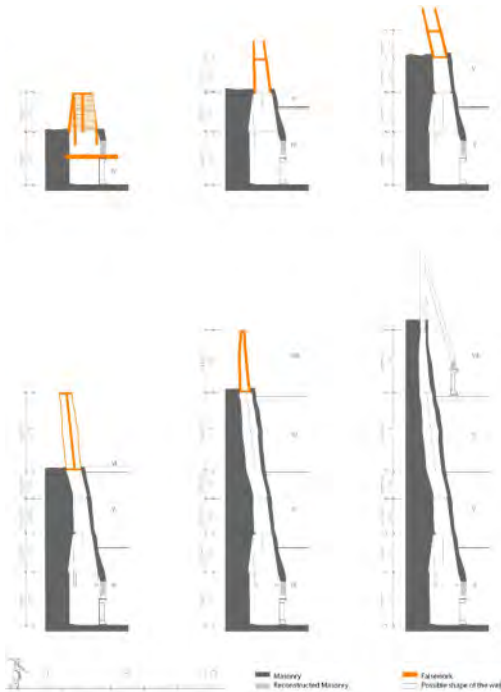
Cross section of the chimney system showing the possible construction process and the reconstructed falseworks.
